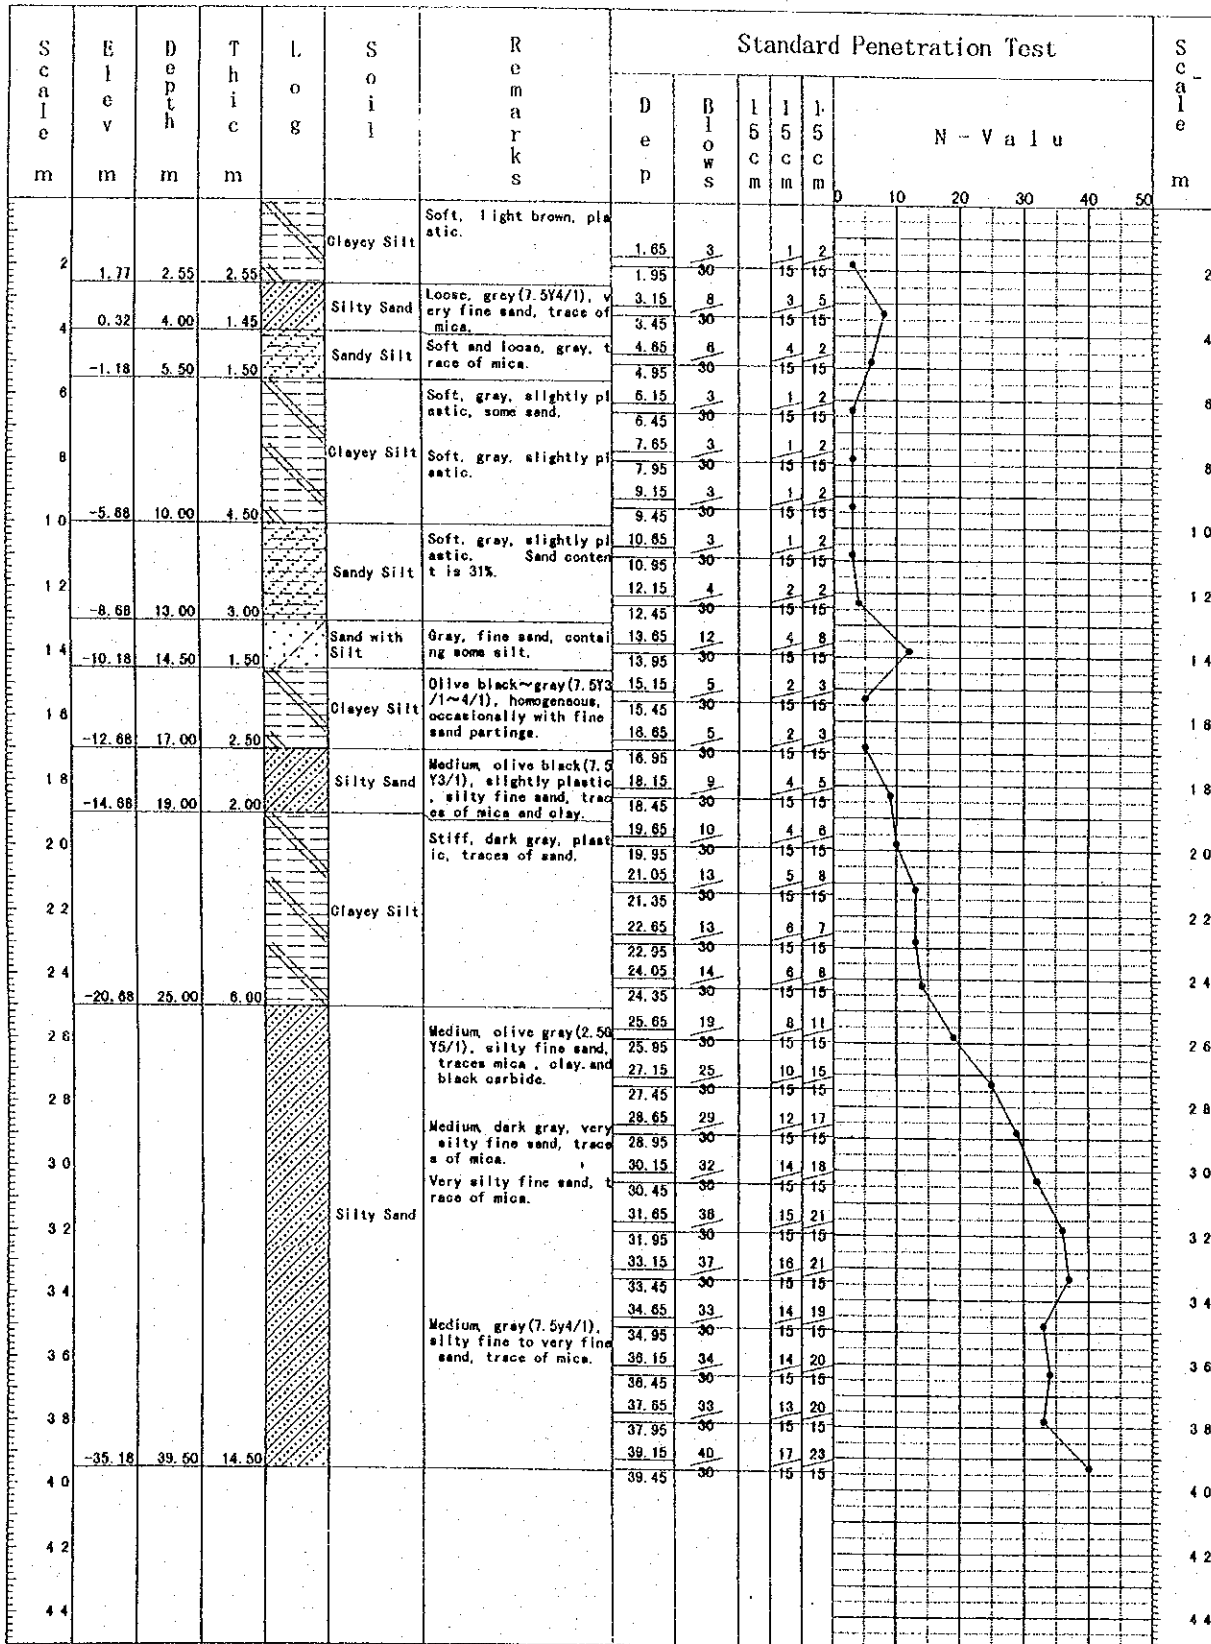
Drilling Log Map at Atai Bridge Site
